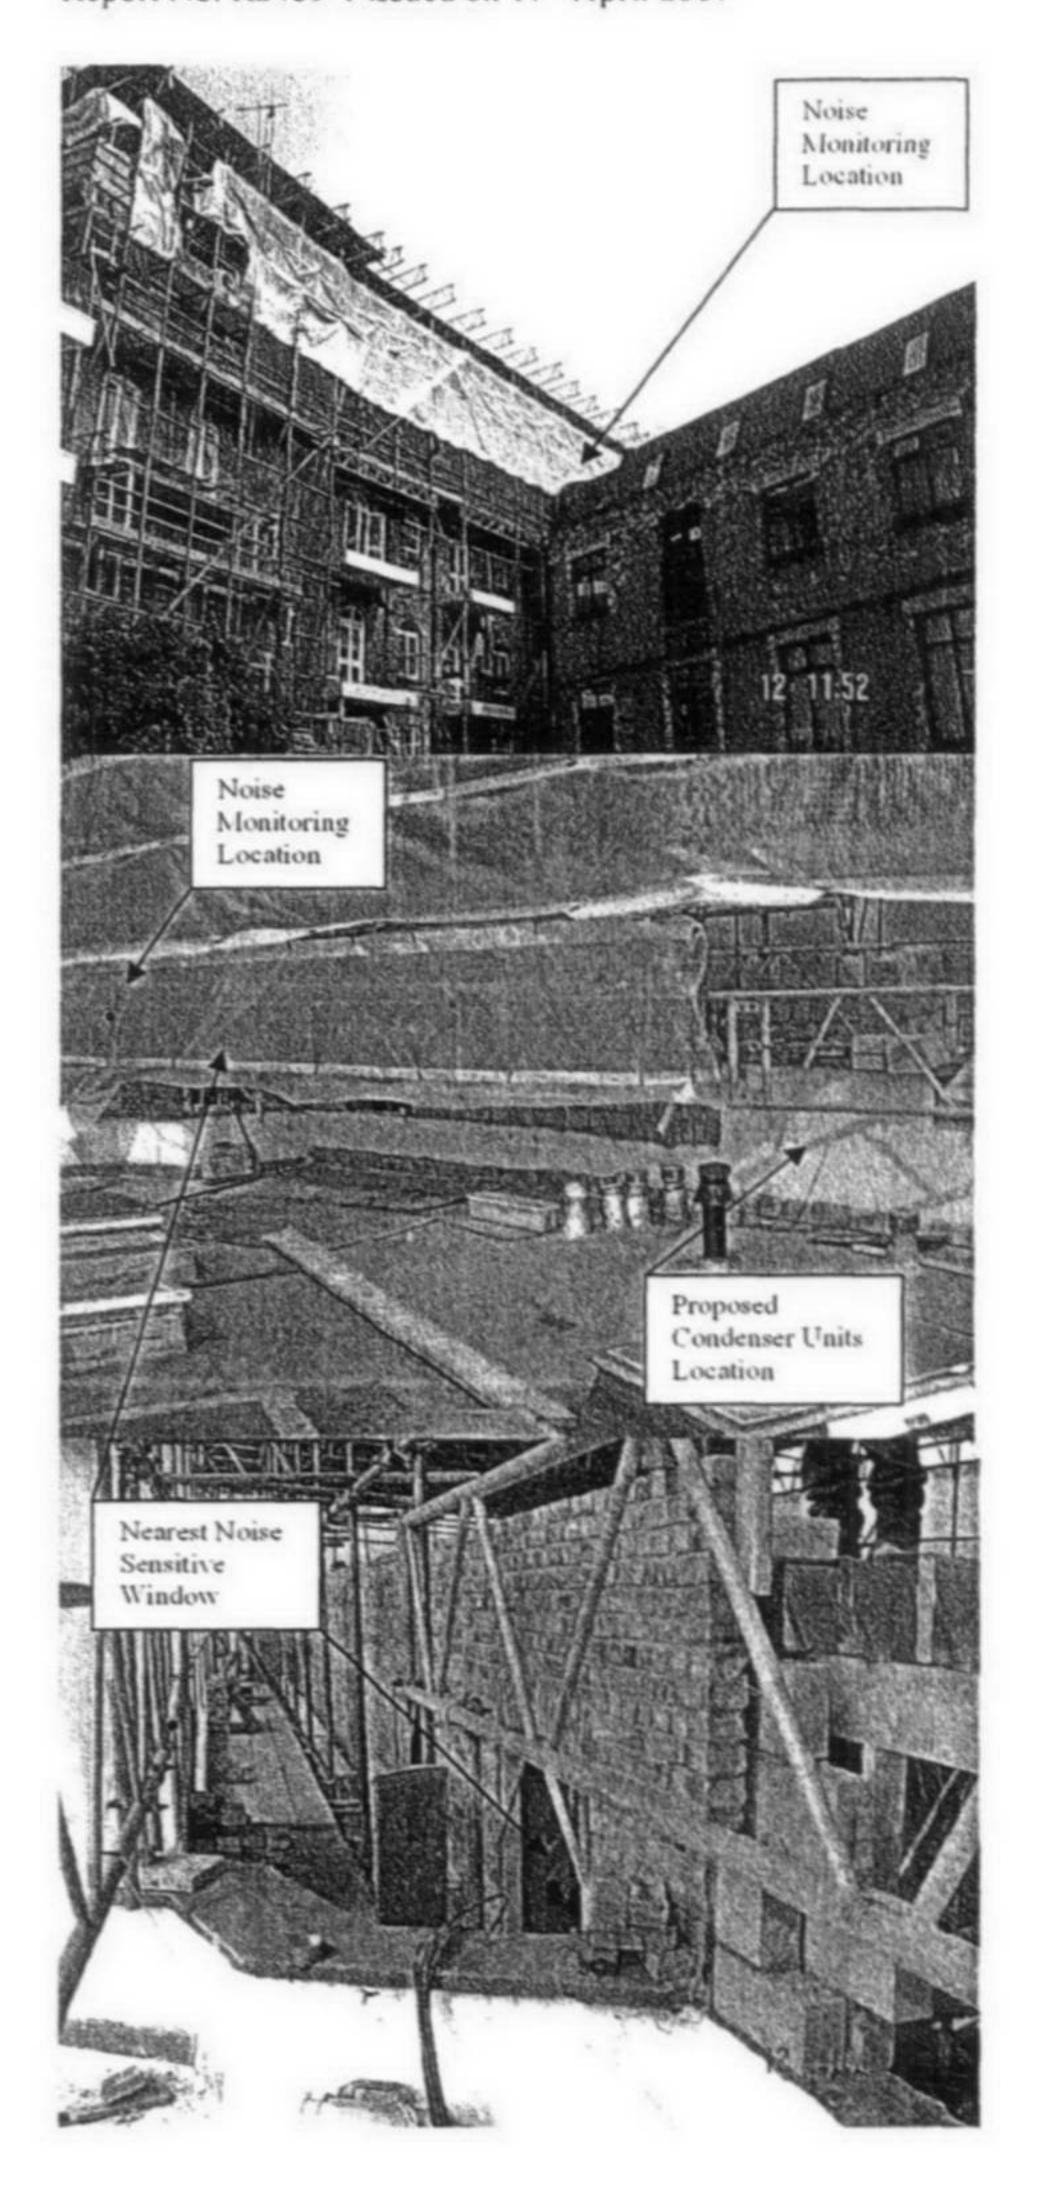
Roof plan showing the location of the proposed units and the nearest noise-sensitive window (n.t.s.)
